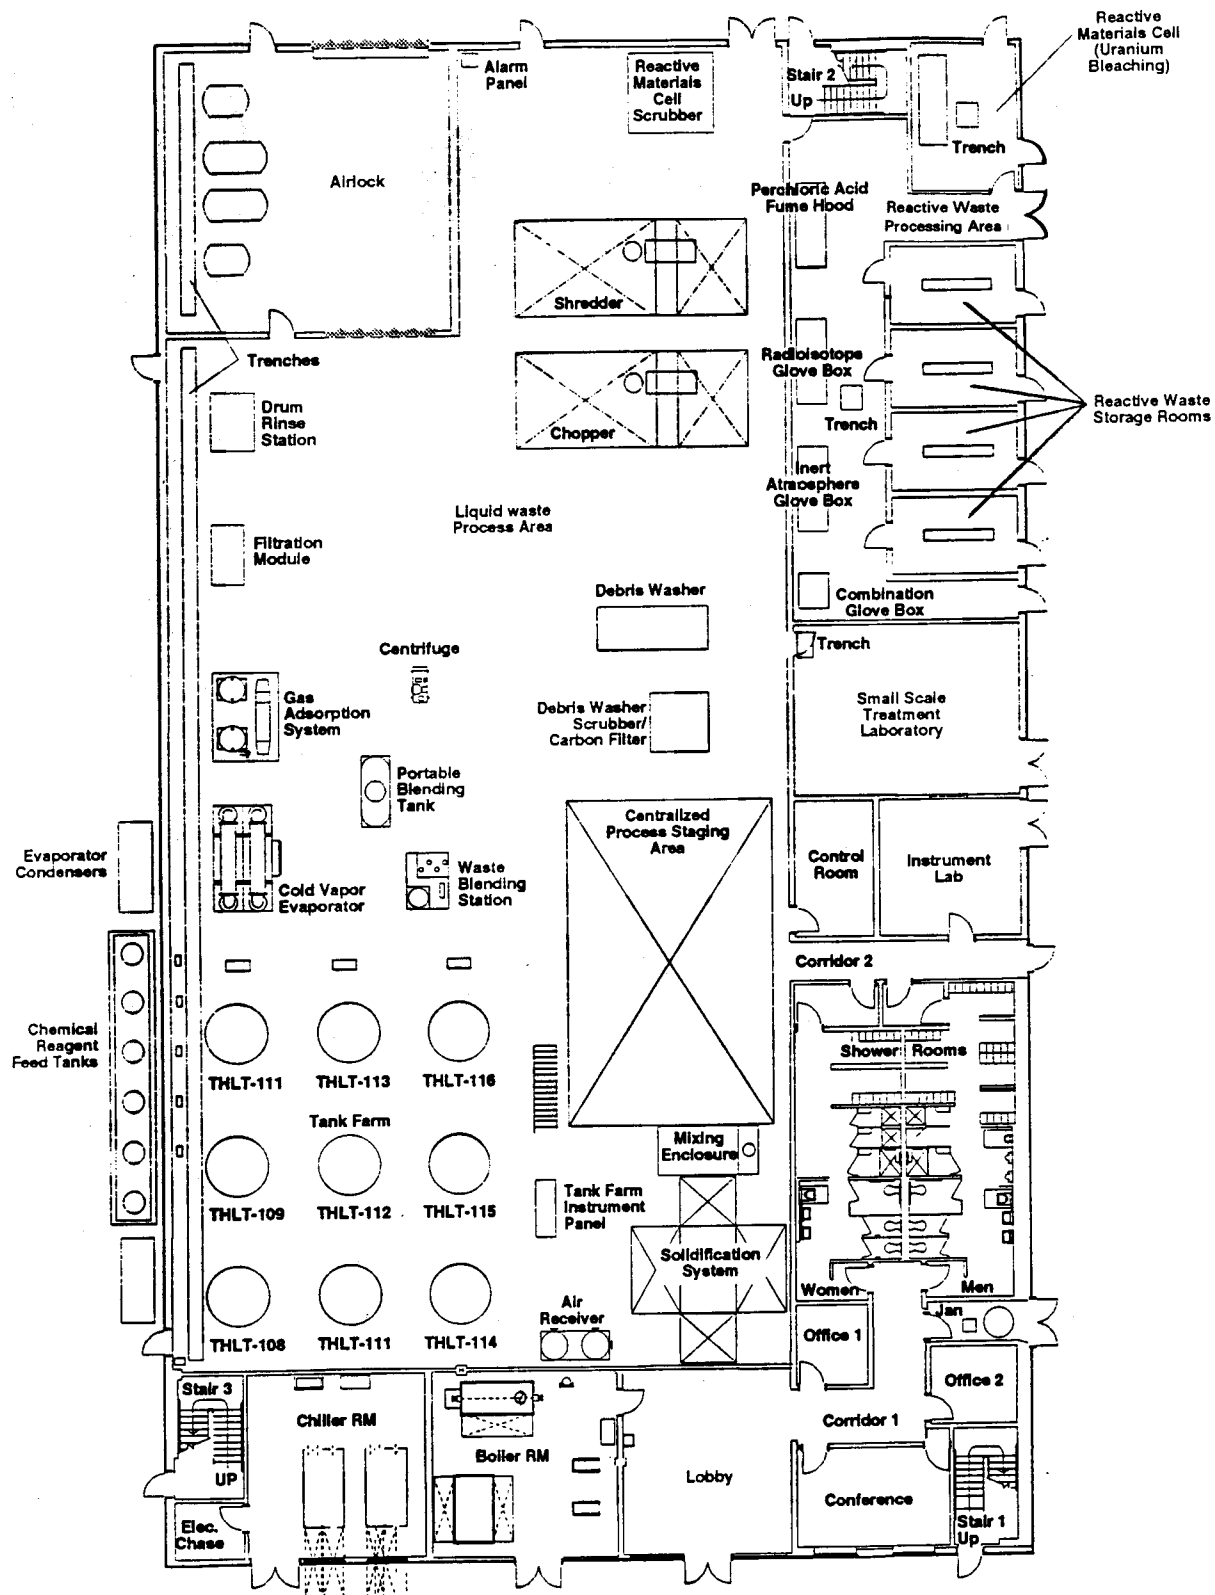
Layout of Building 695 Storage/Treatment Unit Group
